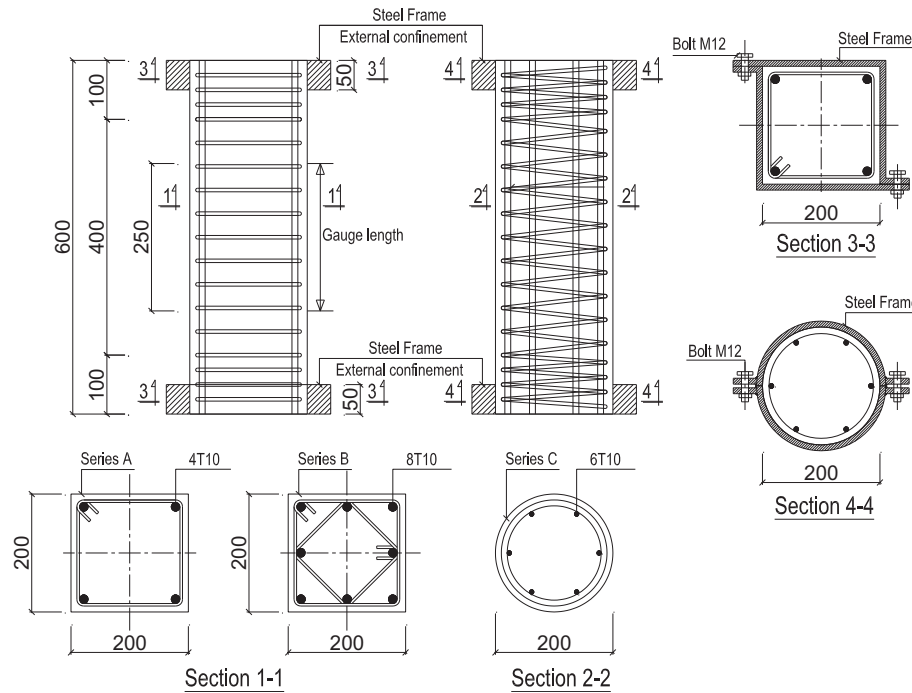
Details of test specimens (note: all dimensions are in mm).
